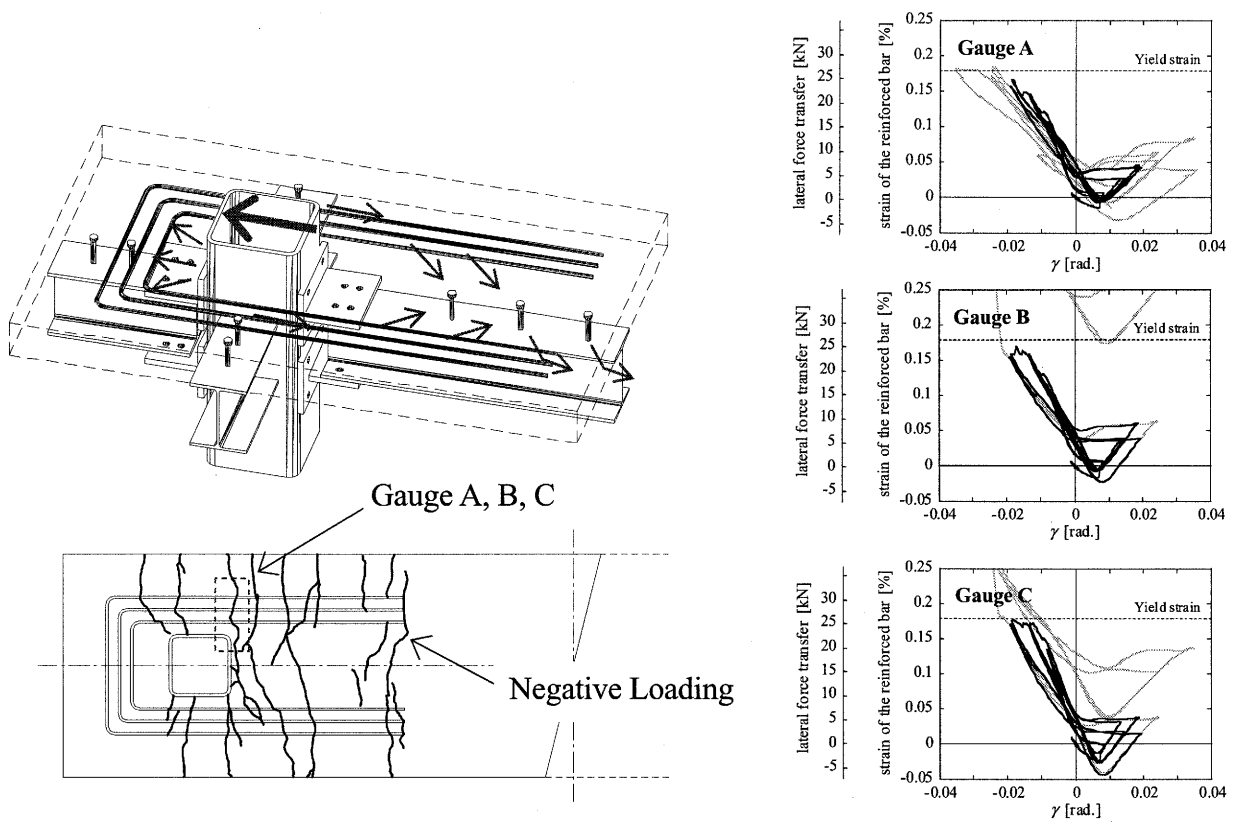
Damage to Concrete Slab and Behavior of Reinforcing Bars (Second Floor)
